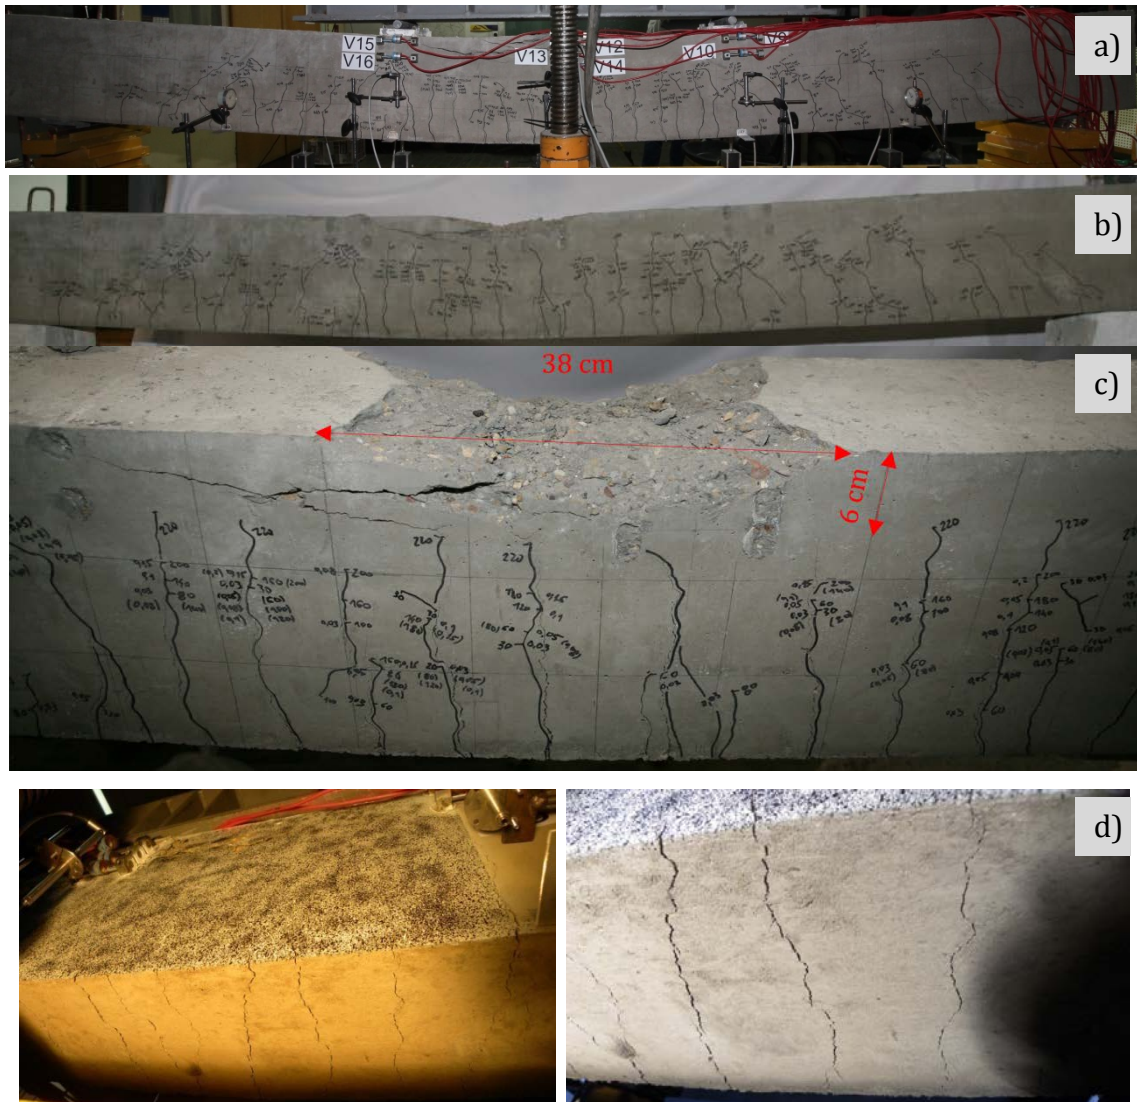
Crack patterns at the failure load for the HVFAC-2 beam: a-b) back side of beams' clear span, c) back side of beams' flexural span, d) cracks development along the beams' width
